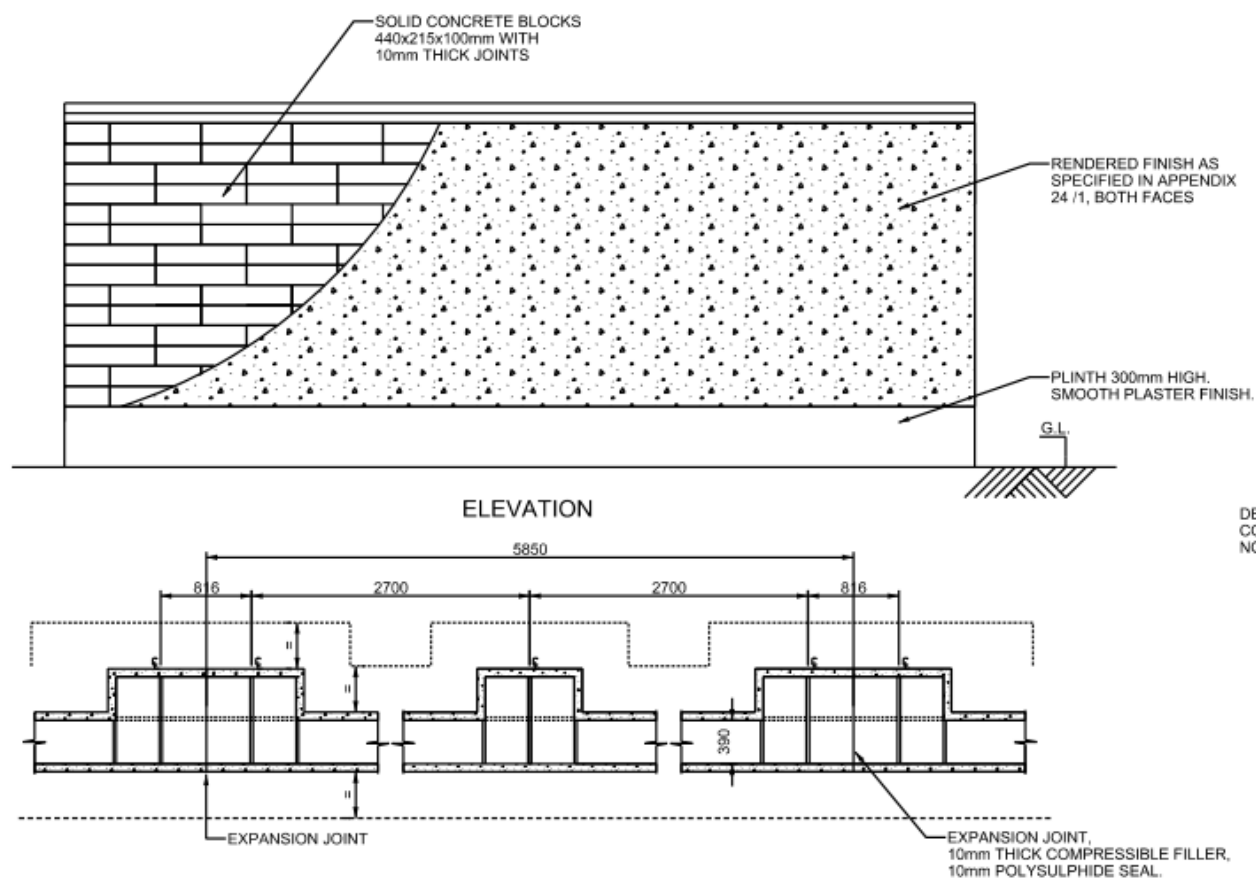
B (ii) TYPICAL BLOCK WALL
